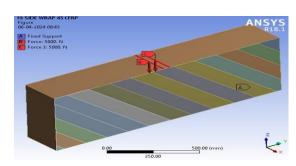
Loading on beam with 45<sup>o</sup> side wrap
